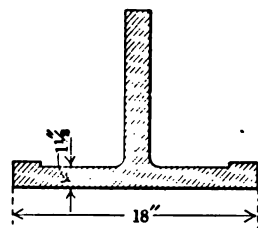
CUBITT'S CAST-IRON SHEET-PILING.
